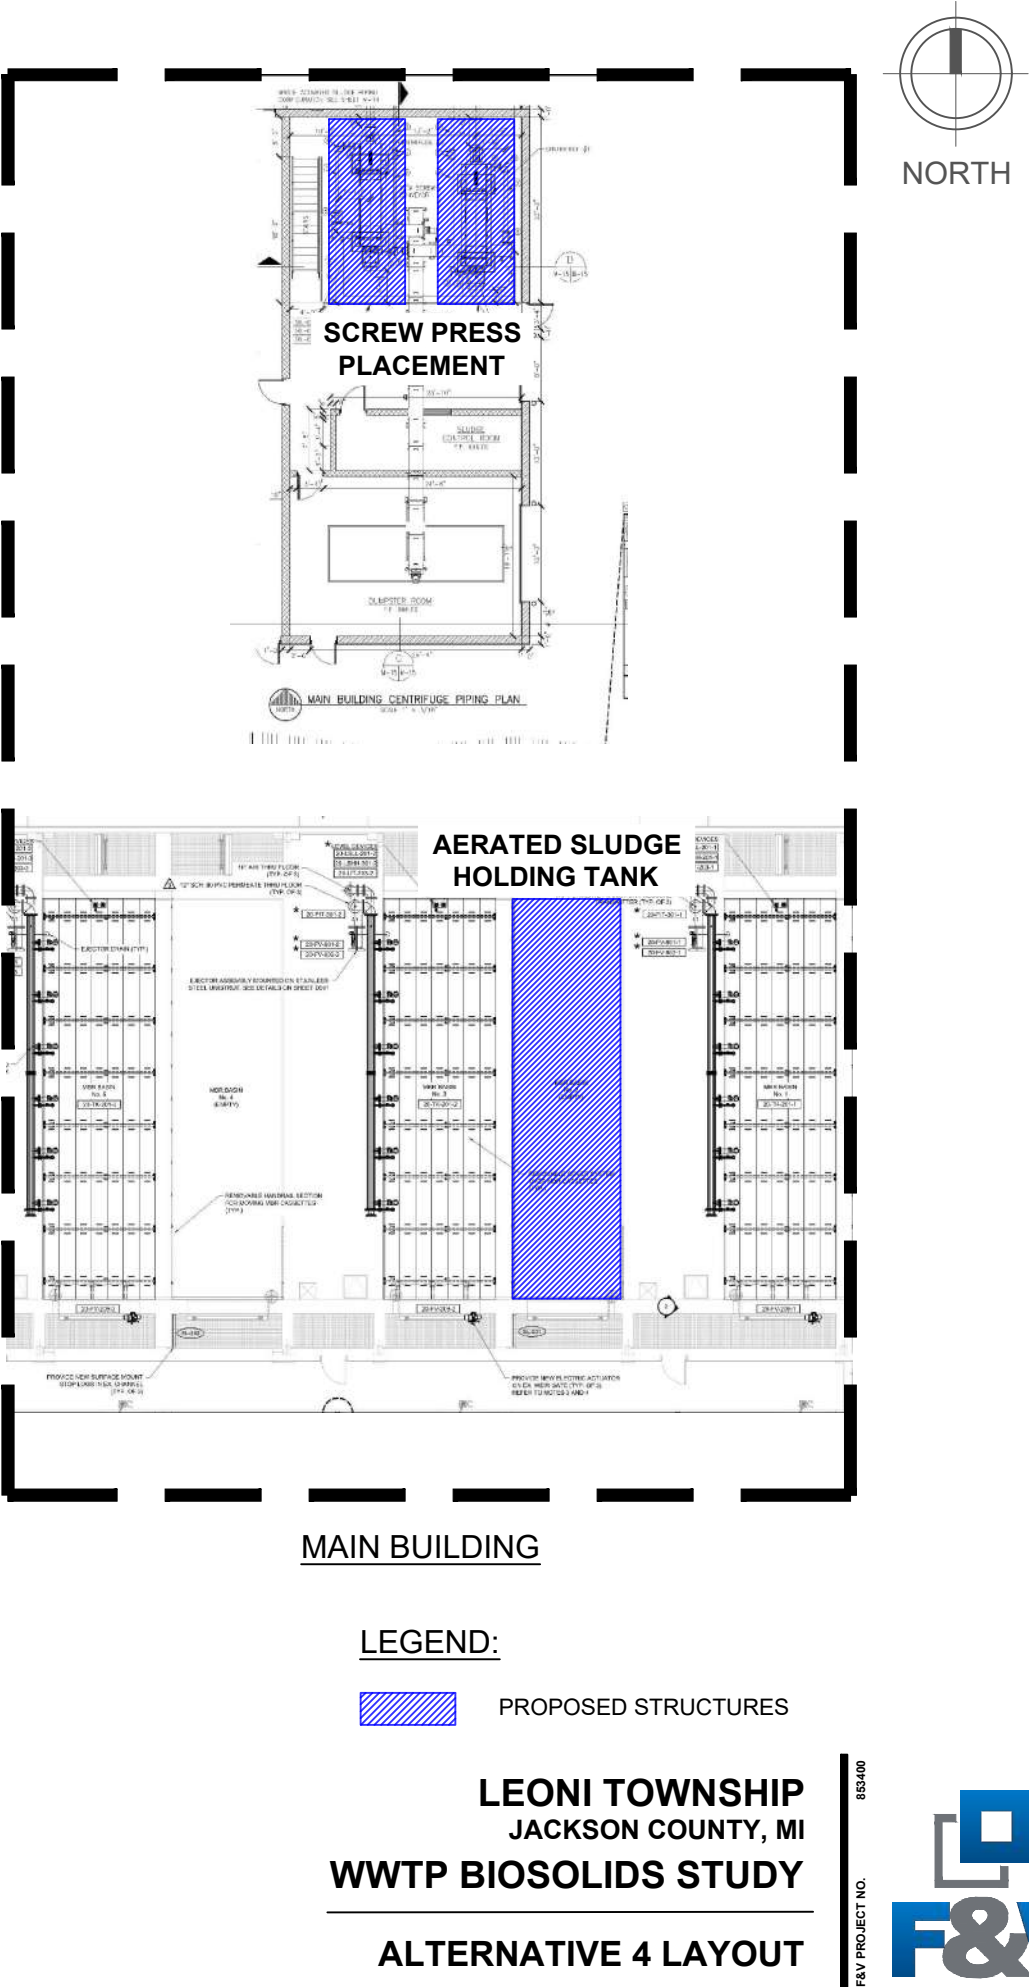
PROPOSED IMPROVEMENTS LAYOUT
